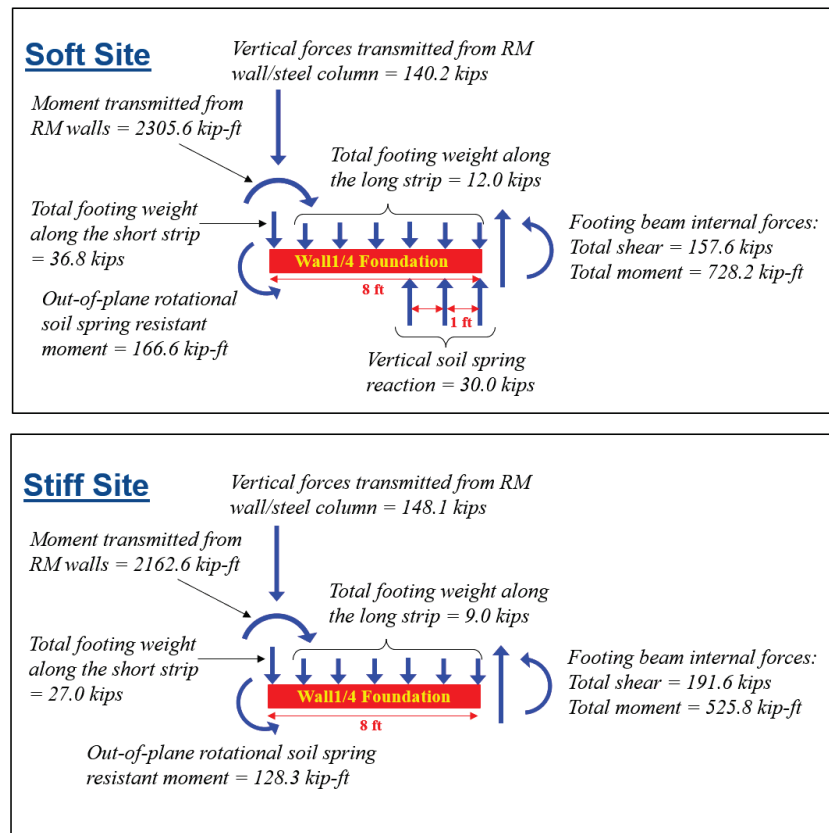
Resistance of foundation slabs to overturning moments of Wall 1 and Wall 4 for the stiff and soft sites at the respective maximum base shear.
